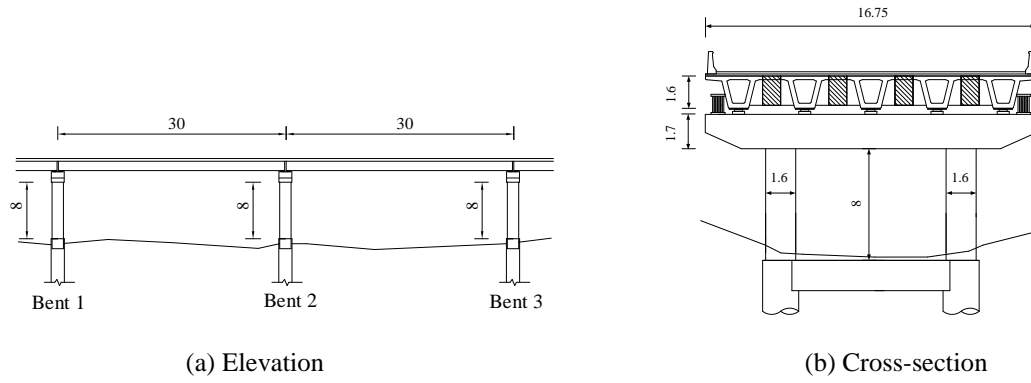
Configurations of Rongjiang Bridge (unit: m)
